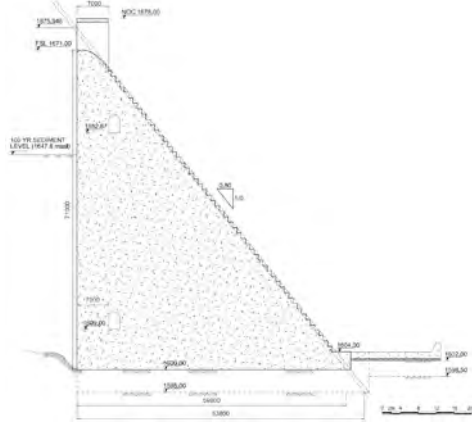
Maximum cross-section of the Metolong Dam spillway.
